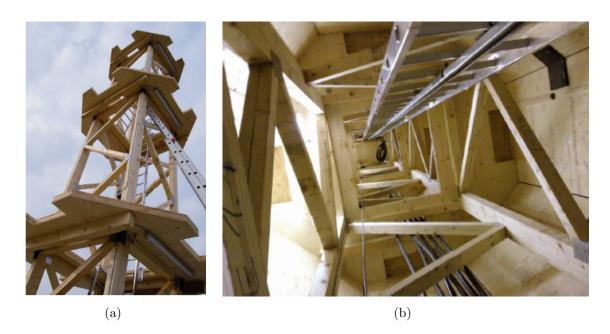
The truss structure supports the power cables, an elevator and a ladder, (a) showing the framework from the outside, (b) from the inside, taken from TIMBERTOWER (2014)
